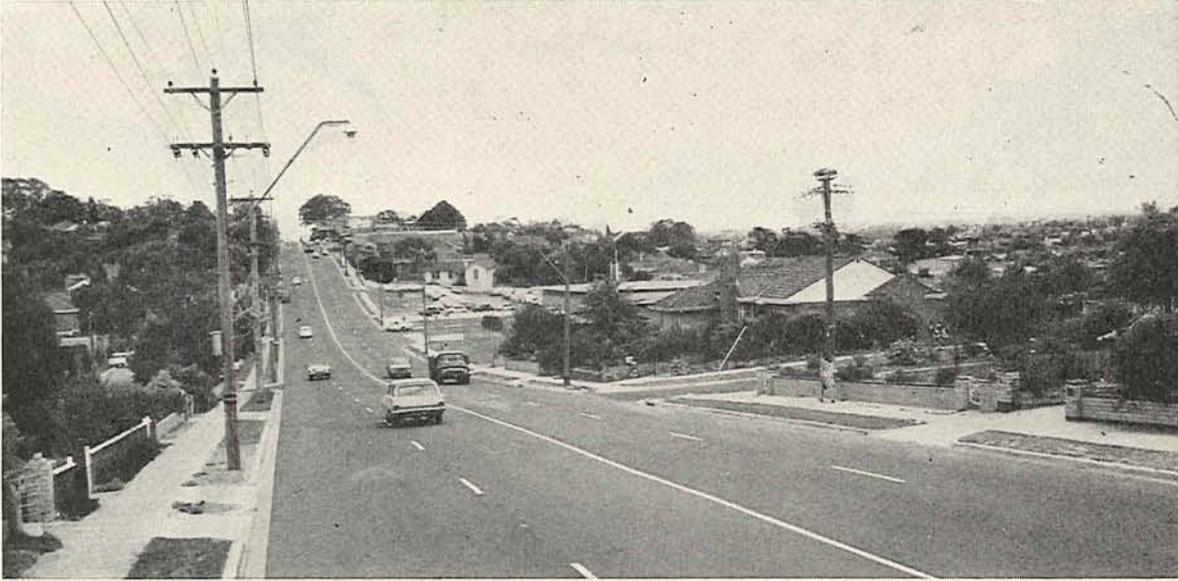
Belmore Road between Wood Street and Greythorn Road, City of Camberwell.
